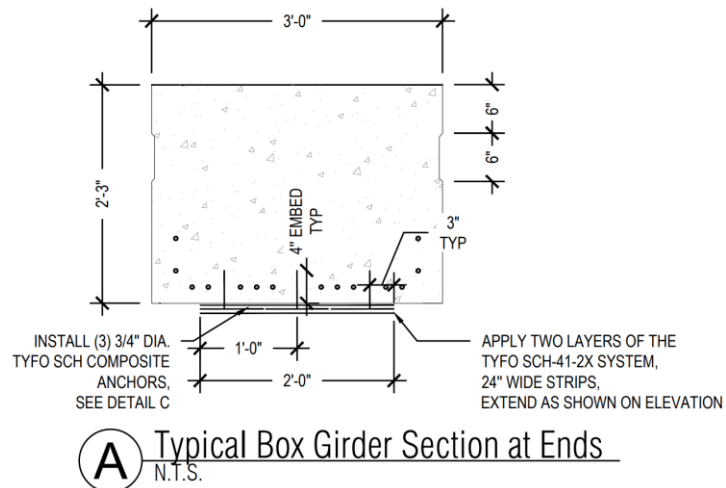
1 Beam 1 retrofit detailing (cont'd)
